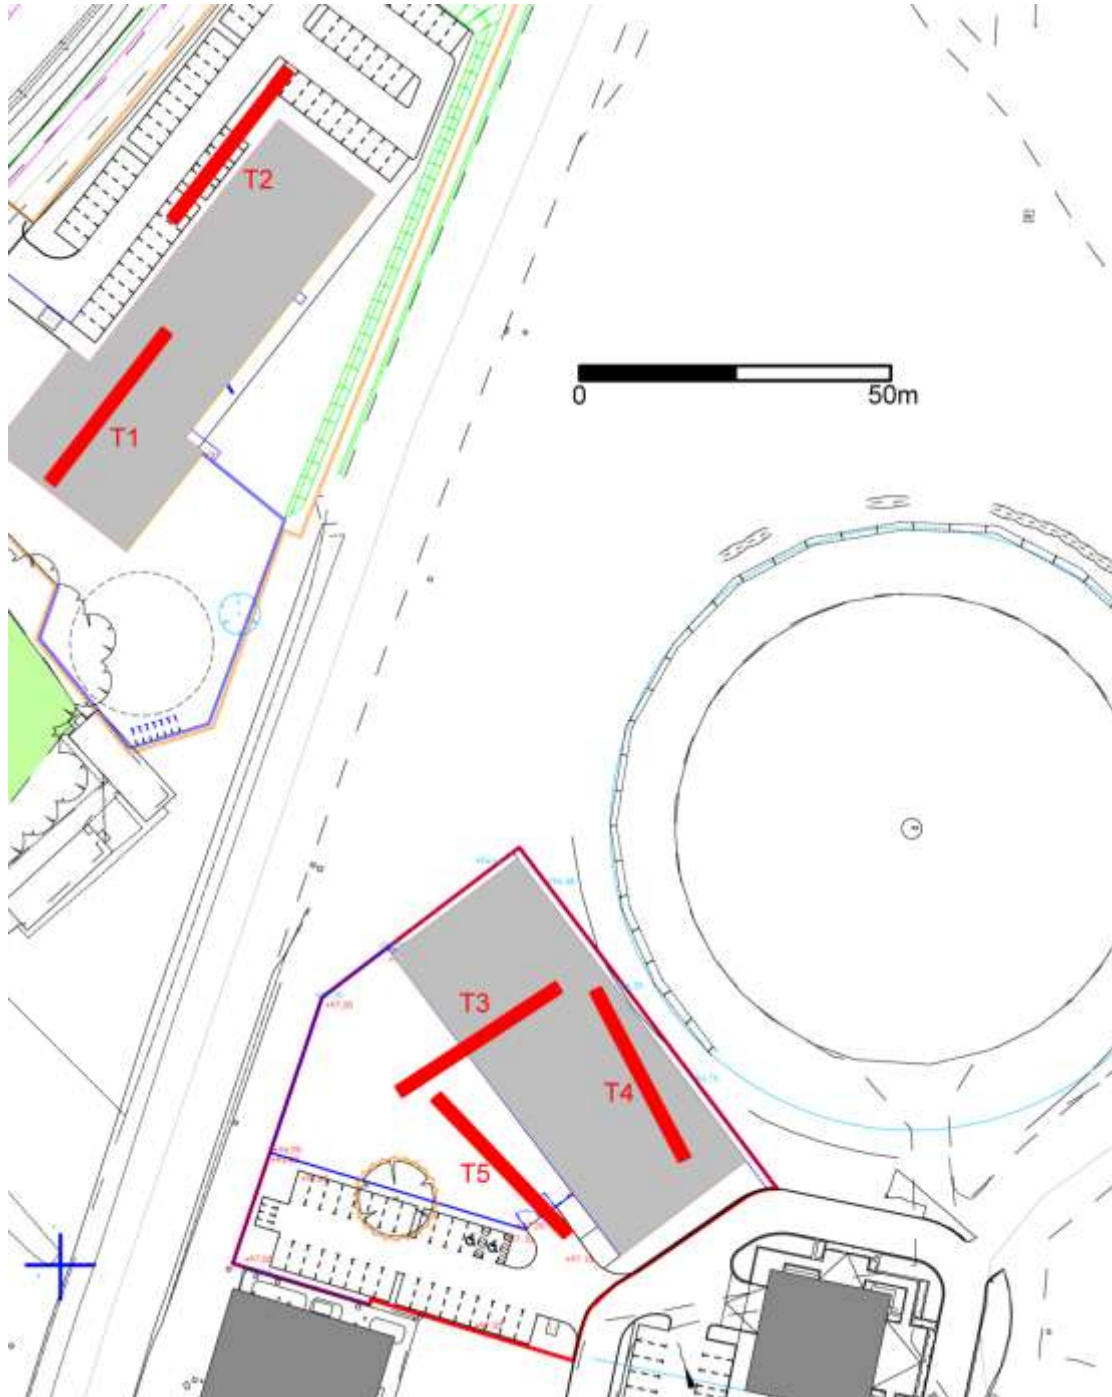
Trench locations in relation to proposed Building 1 (trenches T1-T2) and Building 3 (trenches T3-T5) areas.
